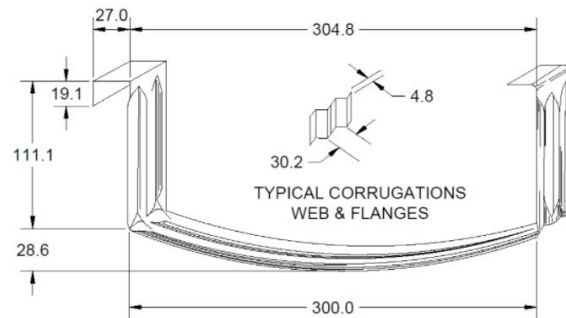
Cross Section and Dimensions of ABM-120 Panel [9]
